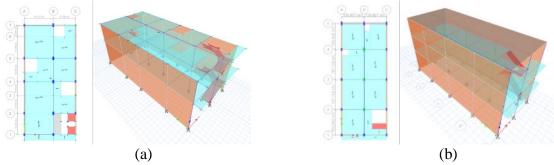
Floor plan and 3D view of the modelling: (a) dwelling 1; (b) dwelling 2.
